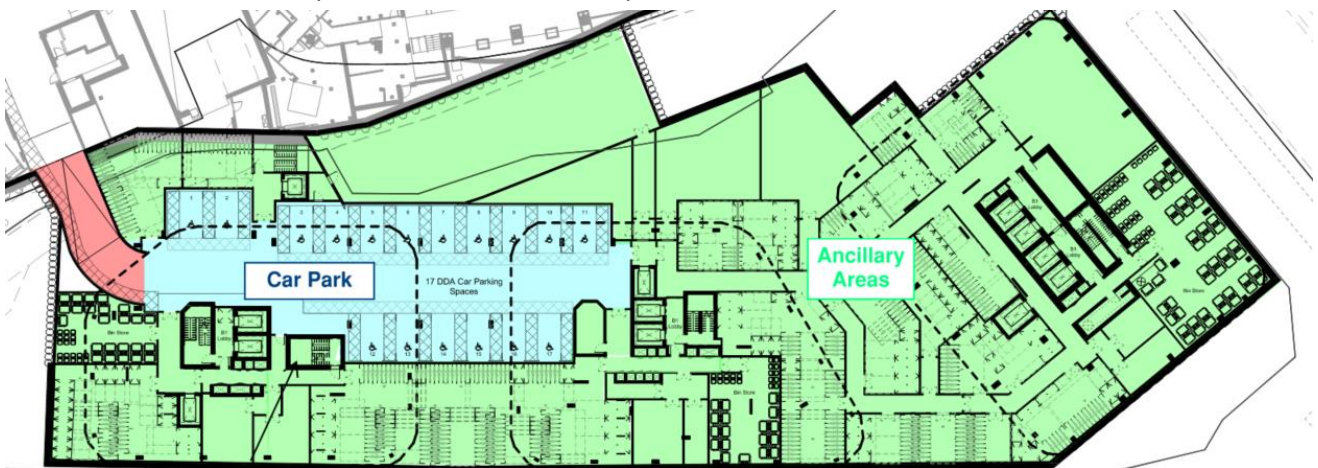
Layout of Basement 1 - Highlighting Car Park and Ancillary Areas
